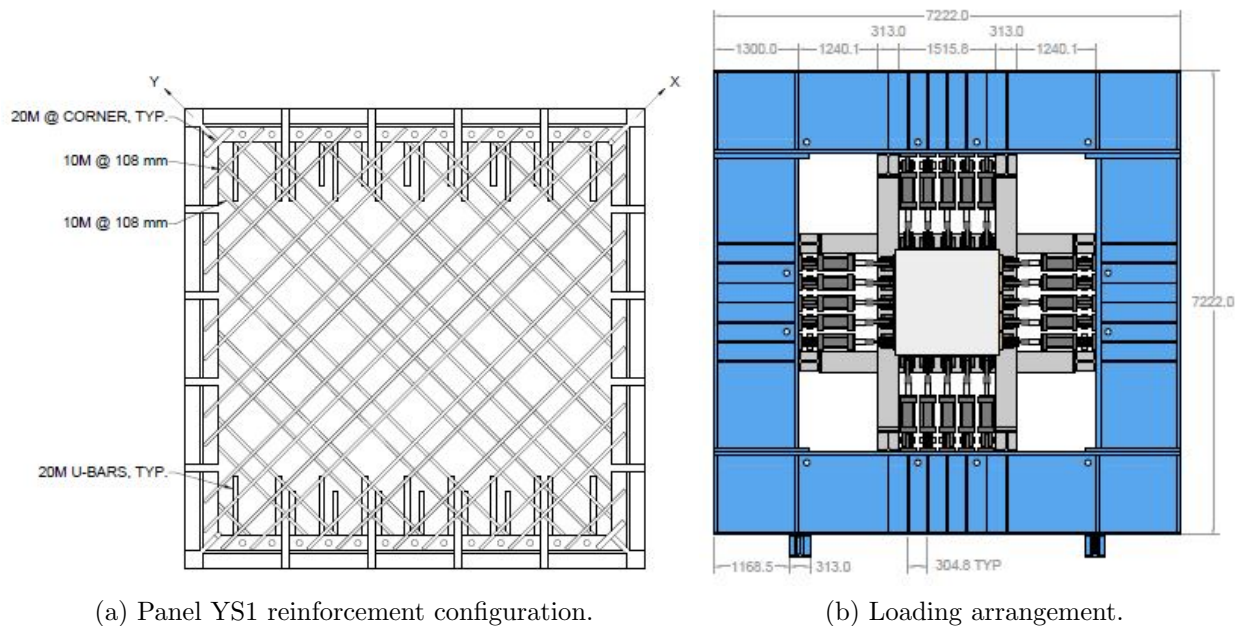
Reinforcement configuration and loading arrangement for panels tested by Yap (2020).
